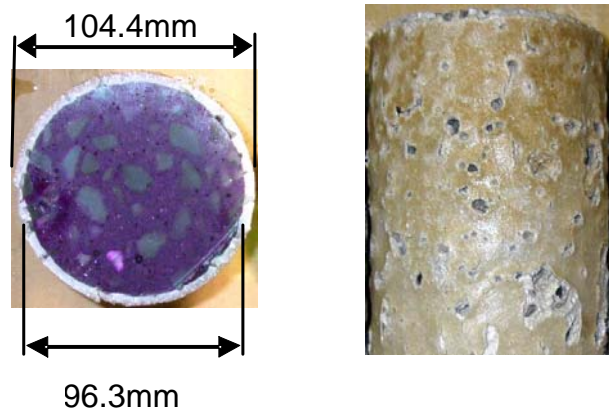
Carbonation of Concrete containing blast furnace slag after sulfuric acid immersion test
